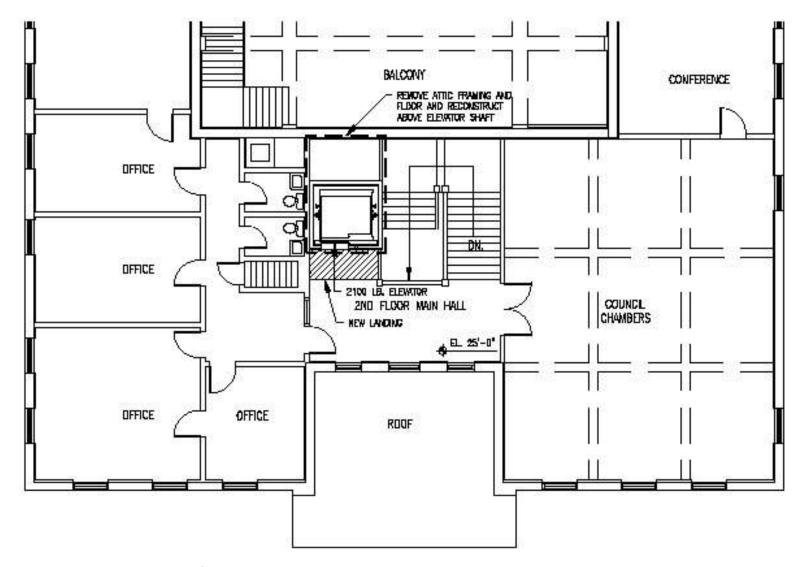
2100 lb. Elevator 2<sup>nd</sup> Floor Plan
